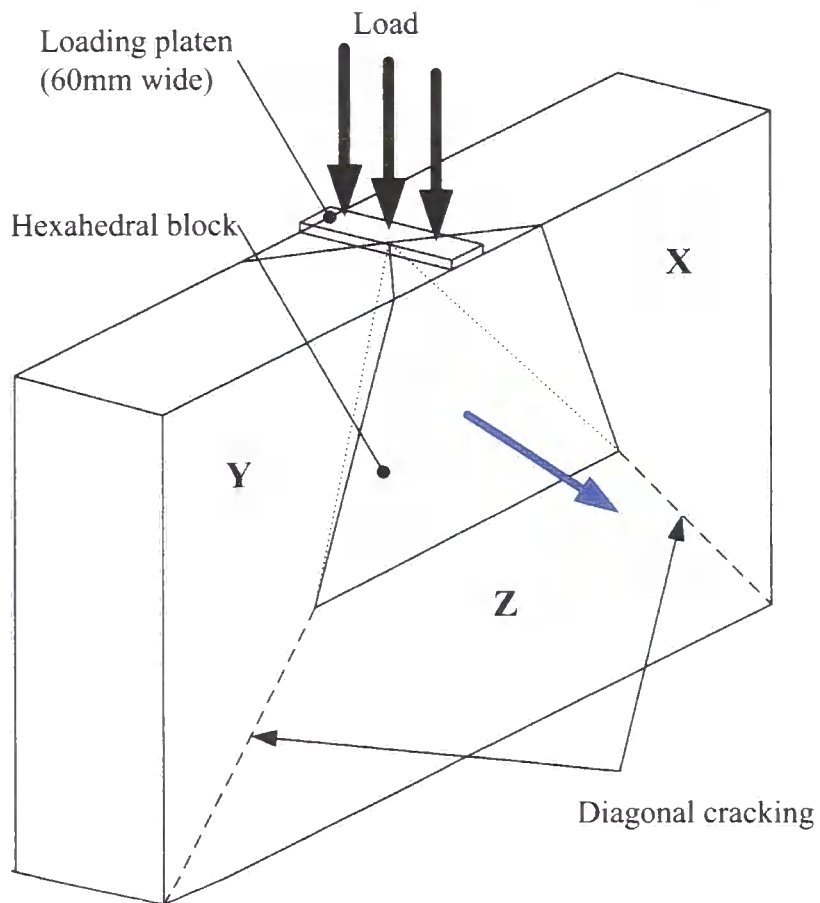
Wall 1, Wall 2.2 side B and wall 3 failure diagram
